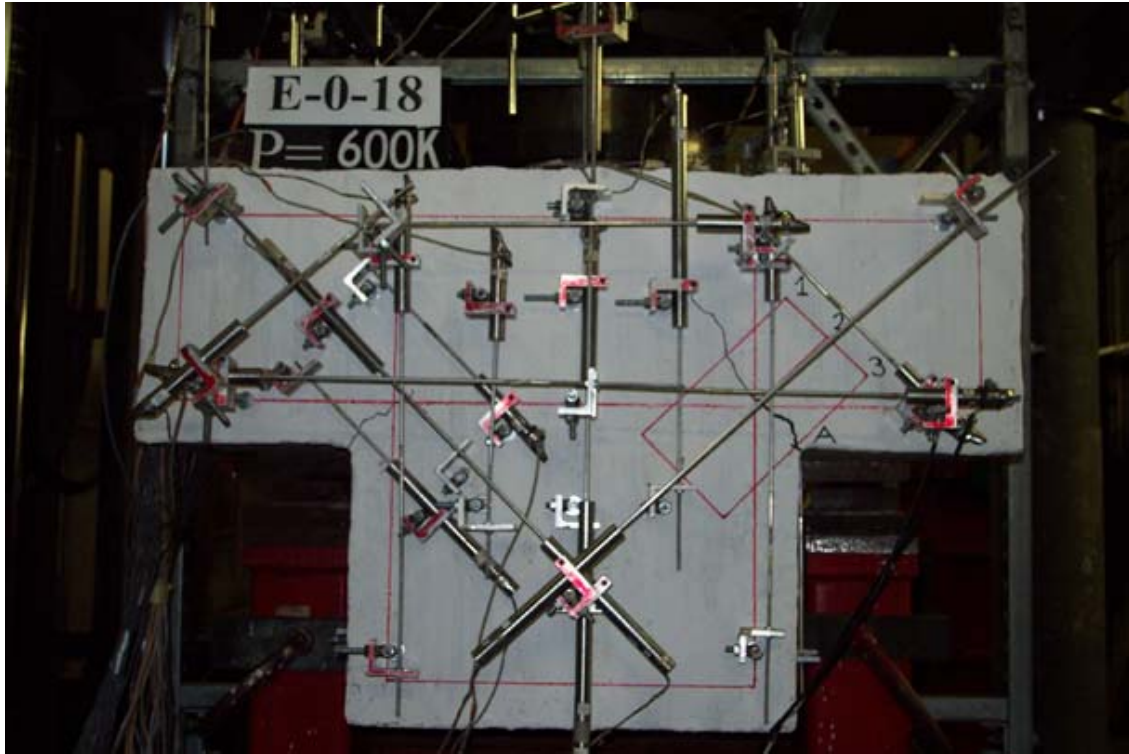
(c) Diagonal cracks in Specimen E-0-18
